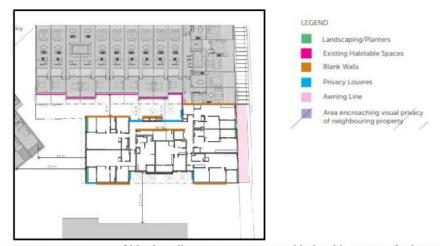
Location of blank walls, privacy screens and habitable rooms of adjoining development
